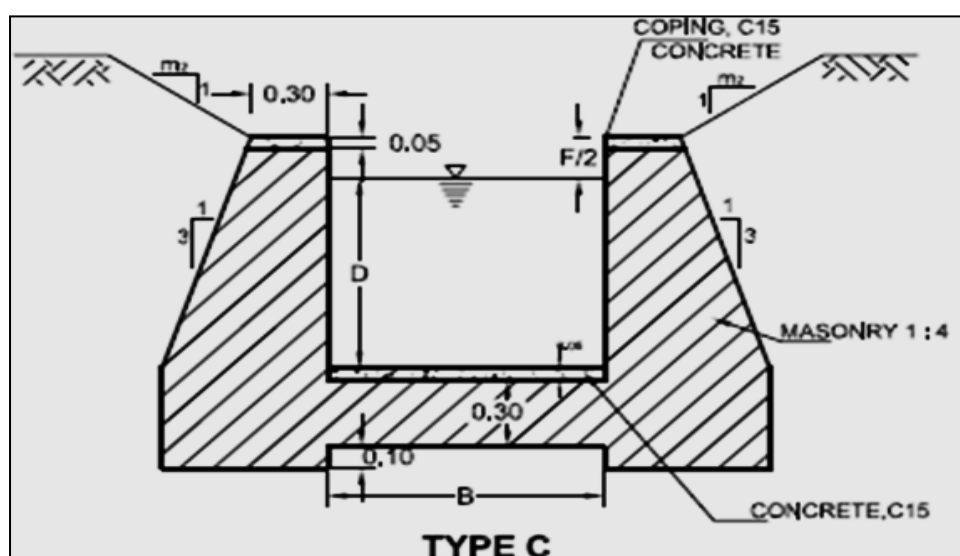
Masonry lining thickness for rectangular canal section (Type-C, on MC)
